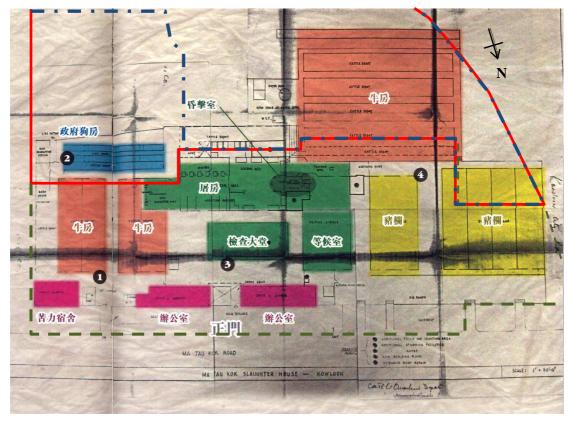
Layout plan of Cattle Depot from 1950 to 1960
